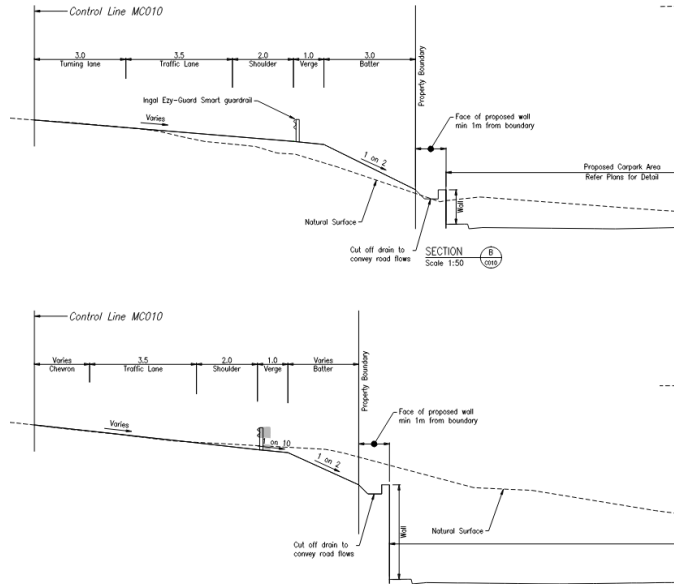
Applicant's engineering sections of proposed retaining wall adjacent the site's frontage
